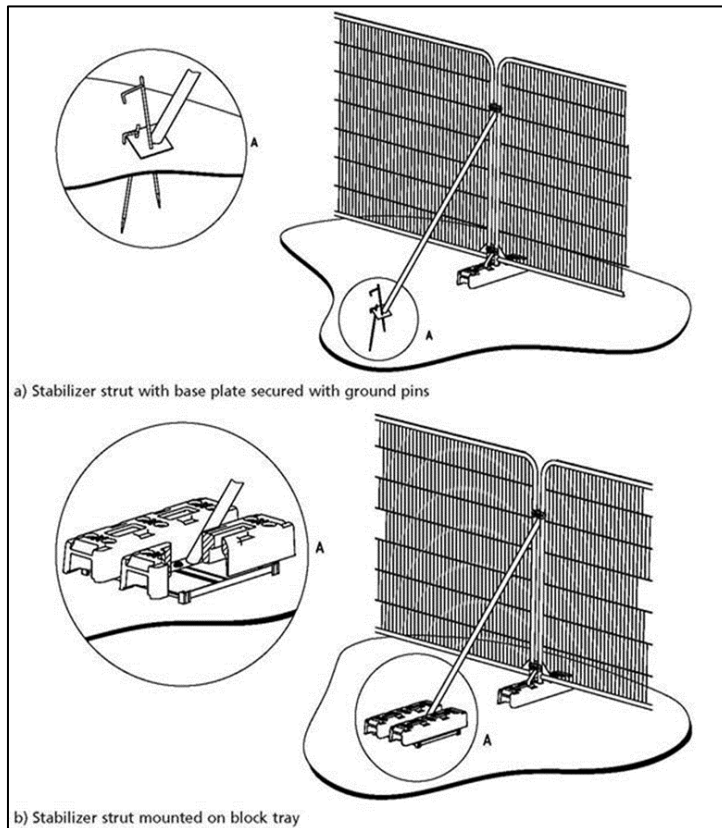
Tree protection fencing specification (extract from BS 5837: 2012)
